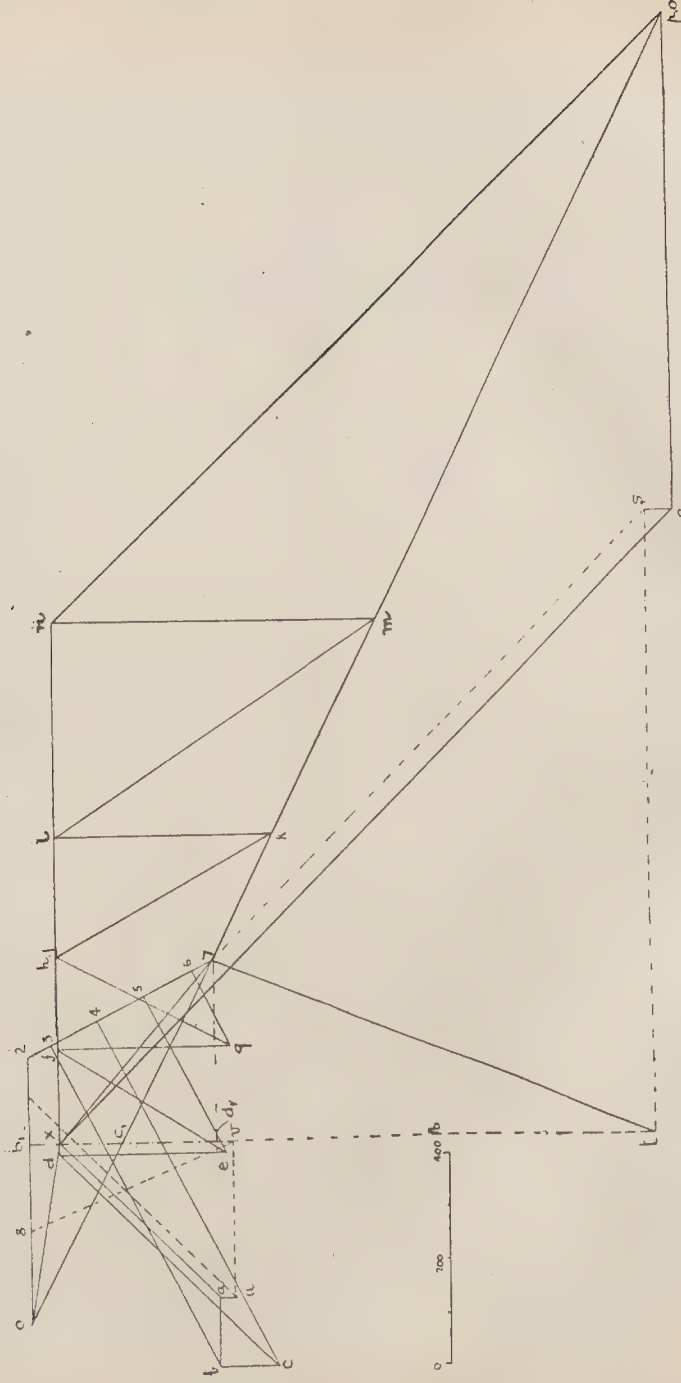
Stress Diagram for Roof Truss with Knee-bracing.
